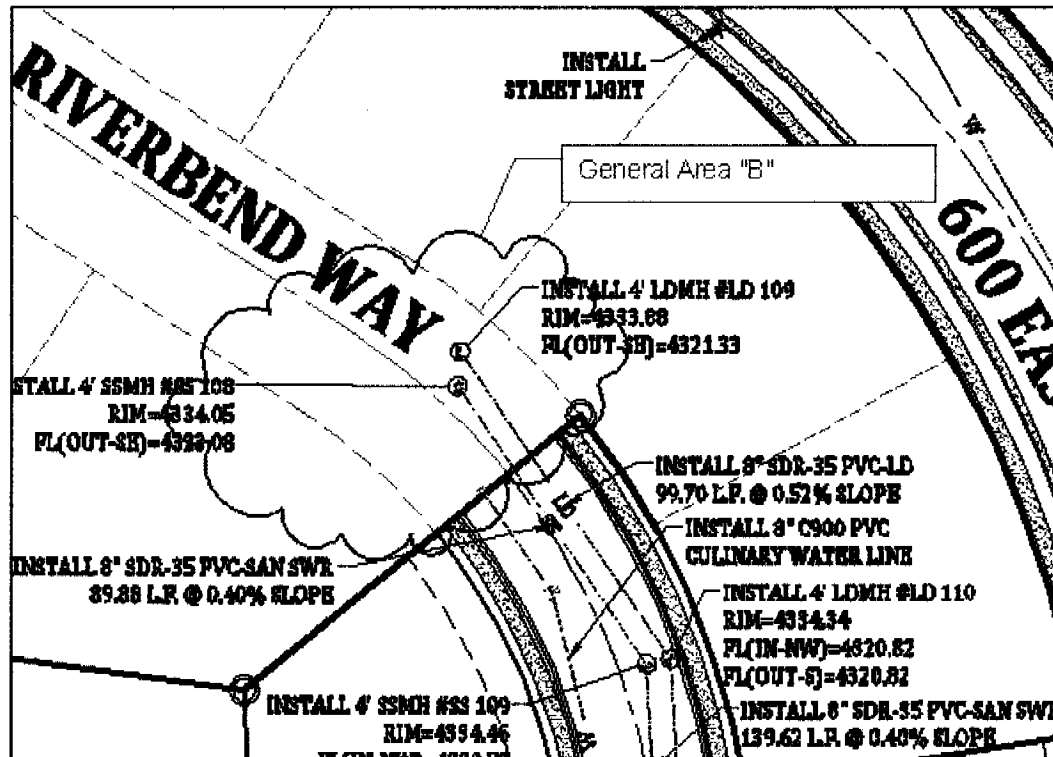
EXHIBIT "B"Access EasementStorm Drain Easement "B"
